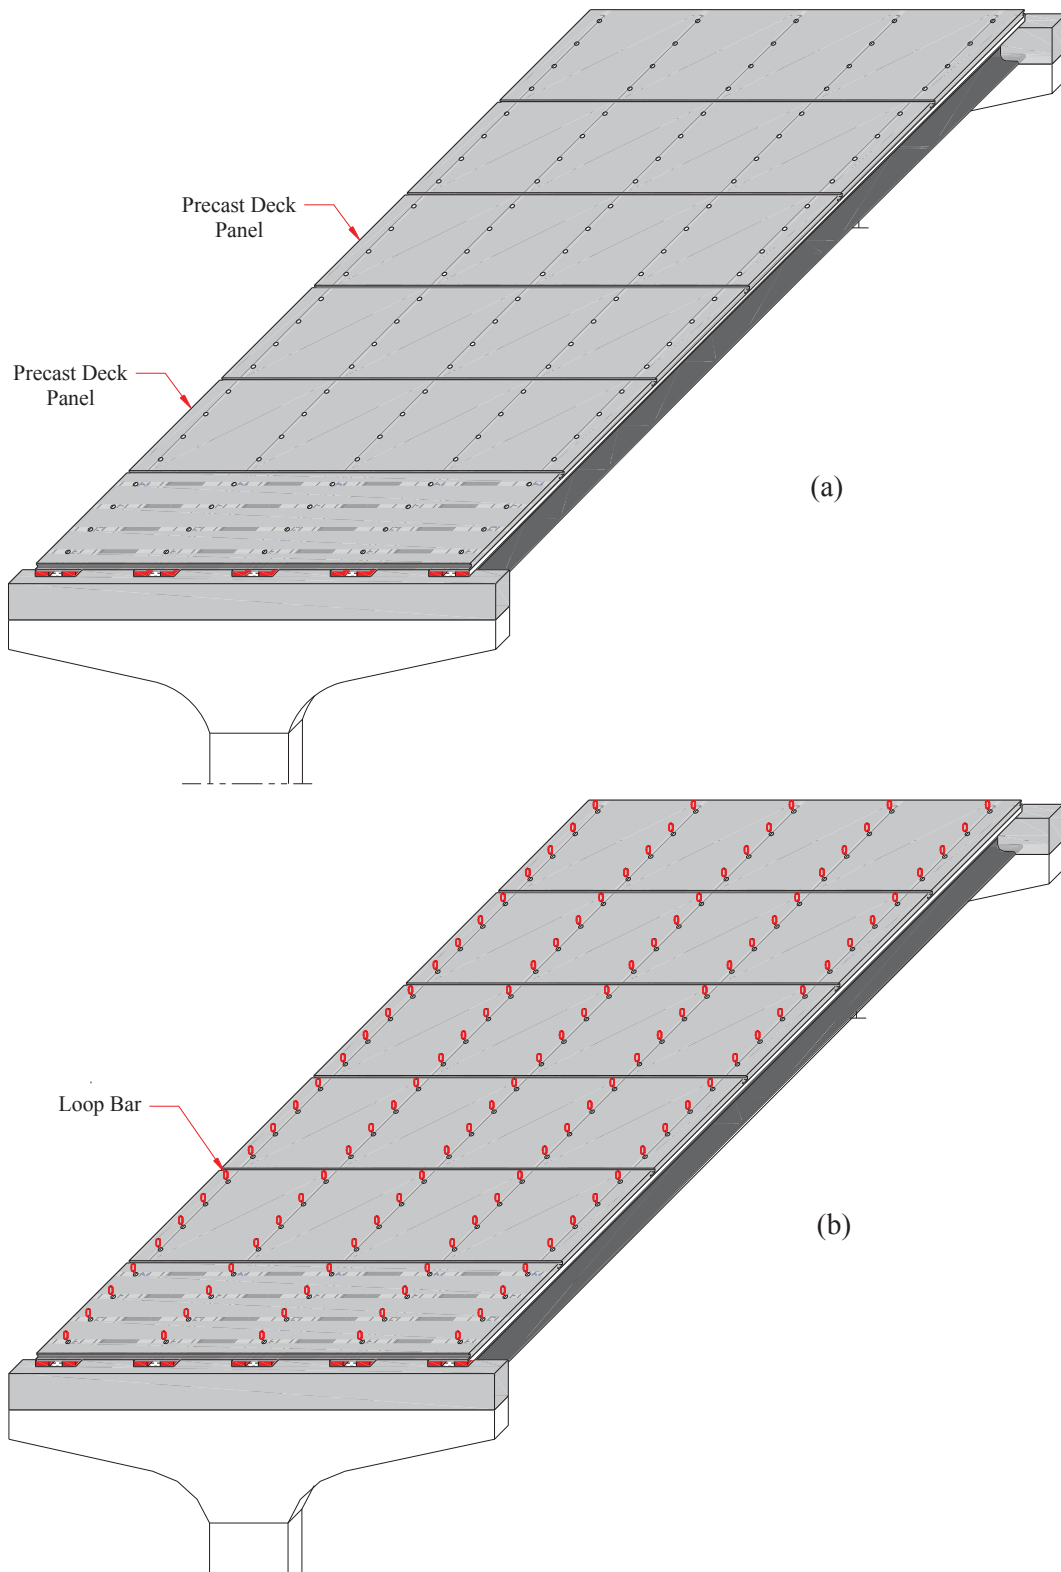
Construction Sequence of the Proposed Precast Concrete Deck-to-Concrete Girder Connection Using UHPC
